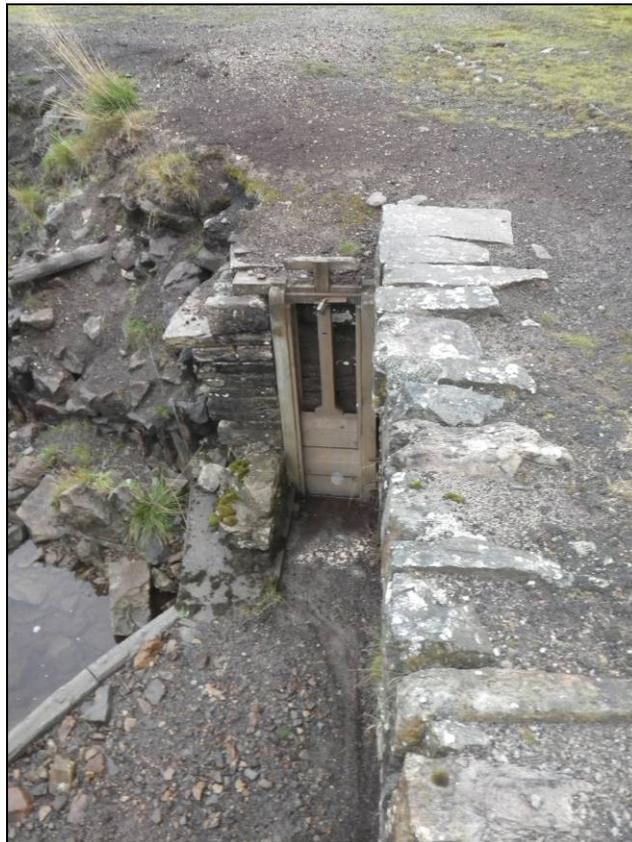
Conduit sluice (2604) outlet from Smelt Mill wheel-pit.
